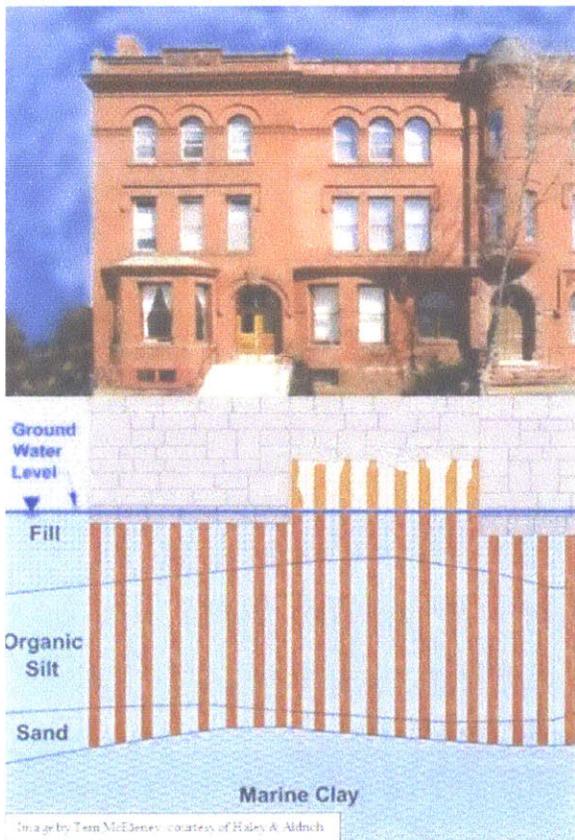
Section showing wooden pilings at risk under Boston buildings. Source: Boston Groundwater Trust (BGT 2013).
